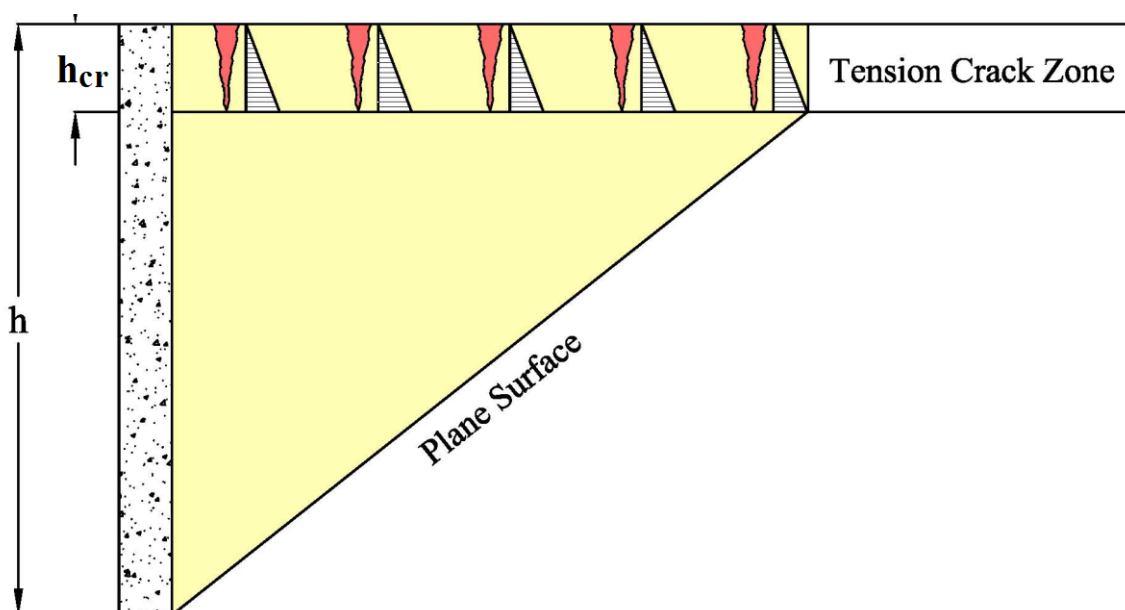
Tension Crack with Hydrostatic Water Pressure
